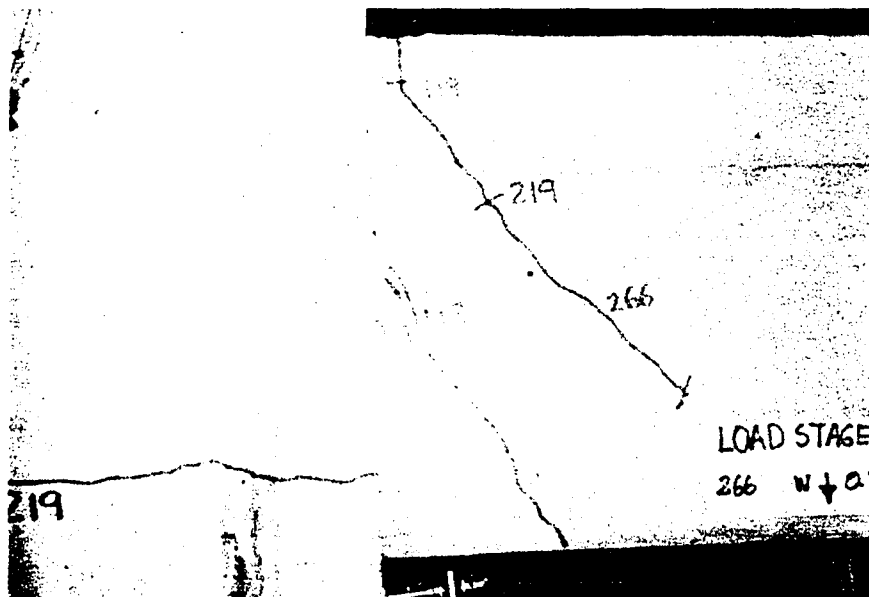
Torsional cracks in transverse beam at D0.75, exterior prototype
